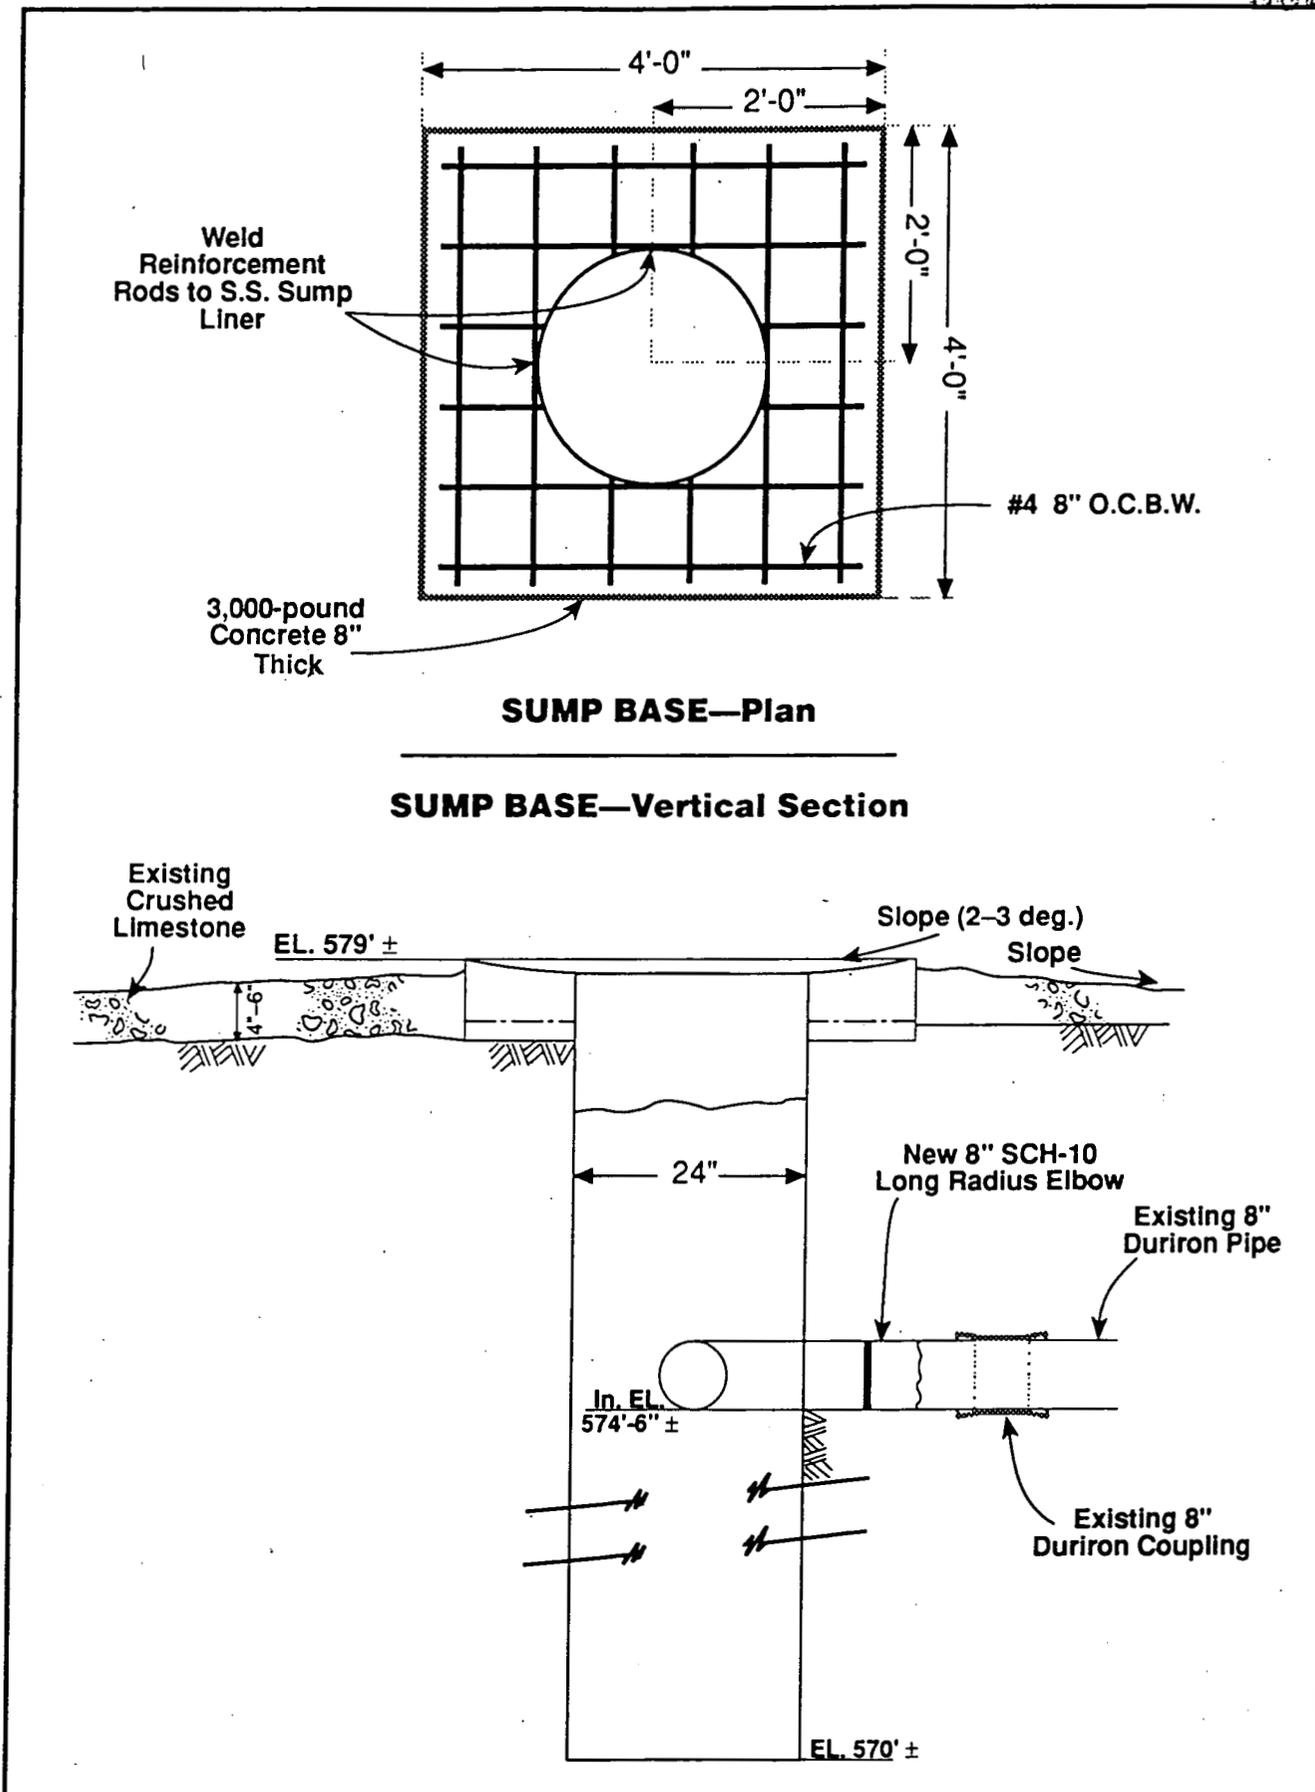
Pilot Plant Temporary Sump--plan and vertical cross section.
